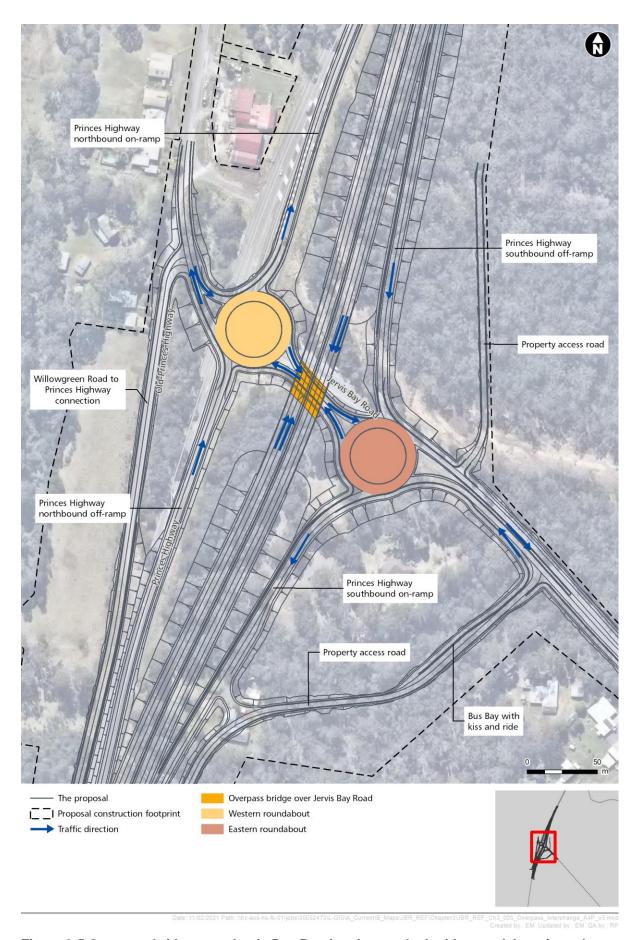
Overpass bridge over Jervis Bay Road and at-grade double roundabout interchange
